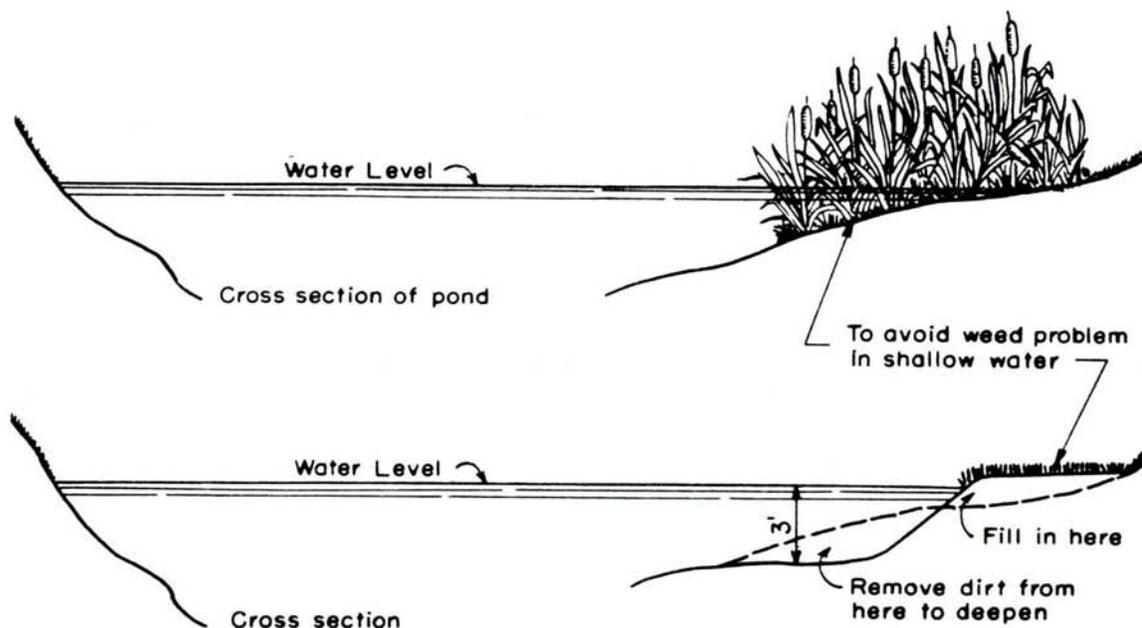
Pond edges should be deepened to control emergent water plants and improve fishing.
